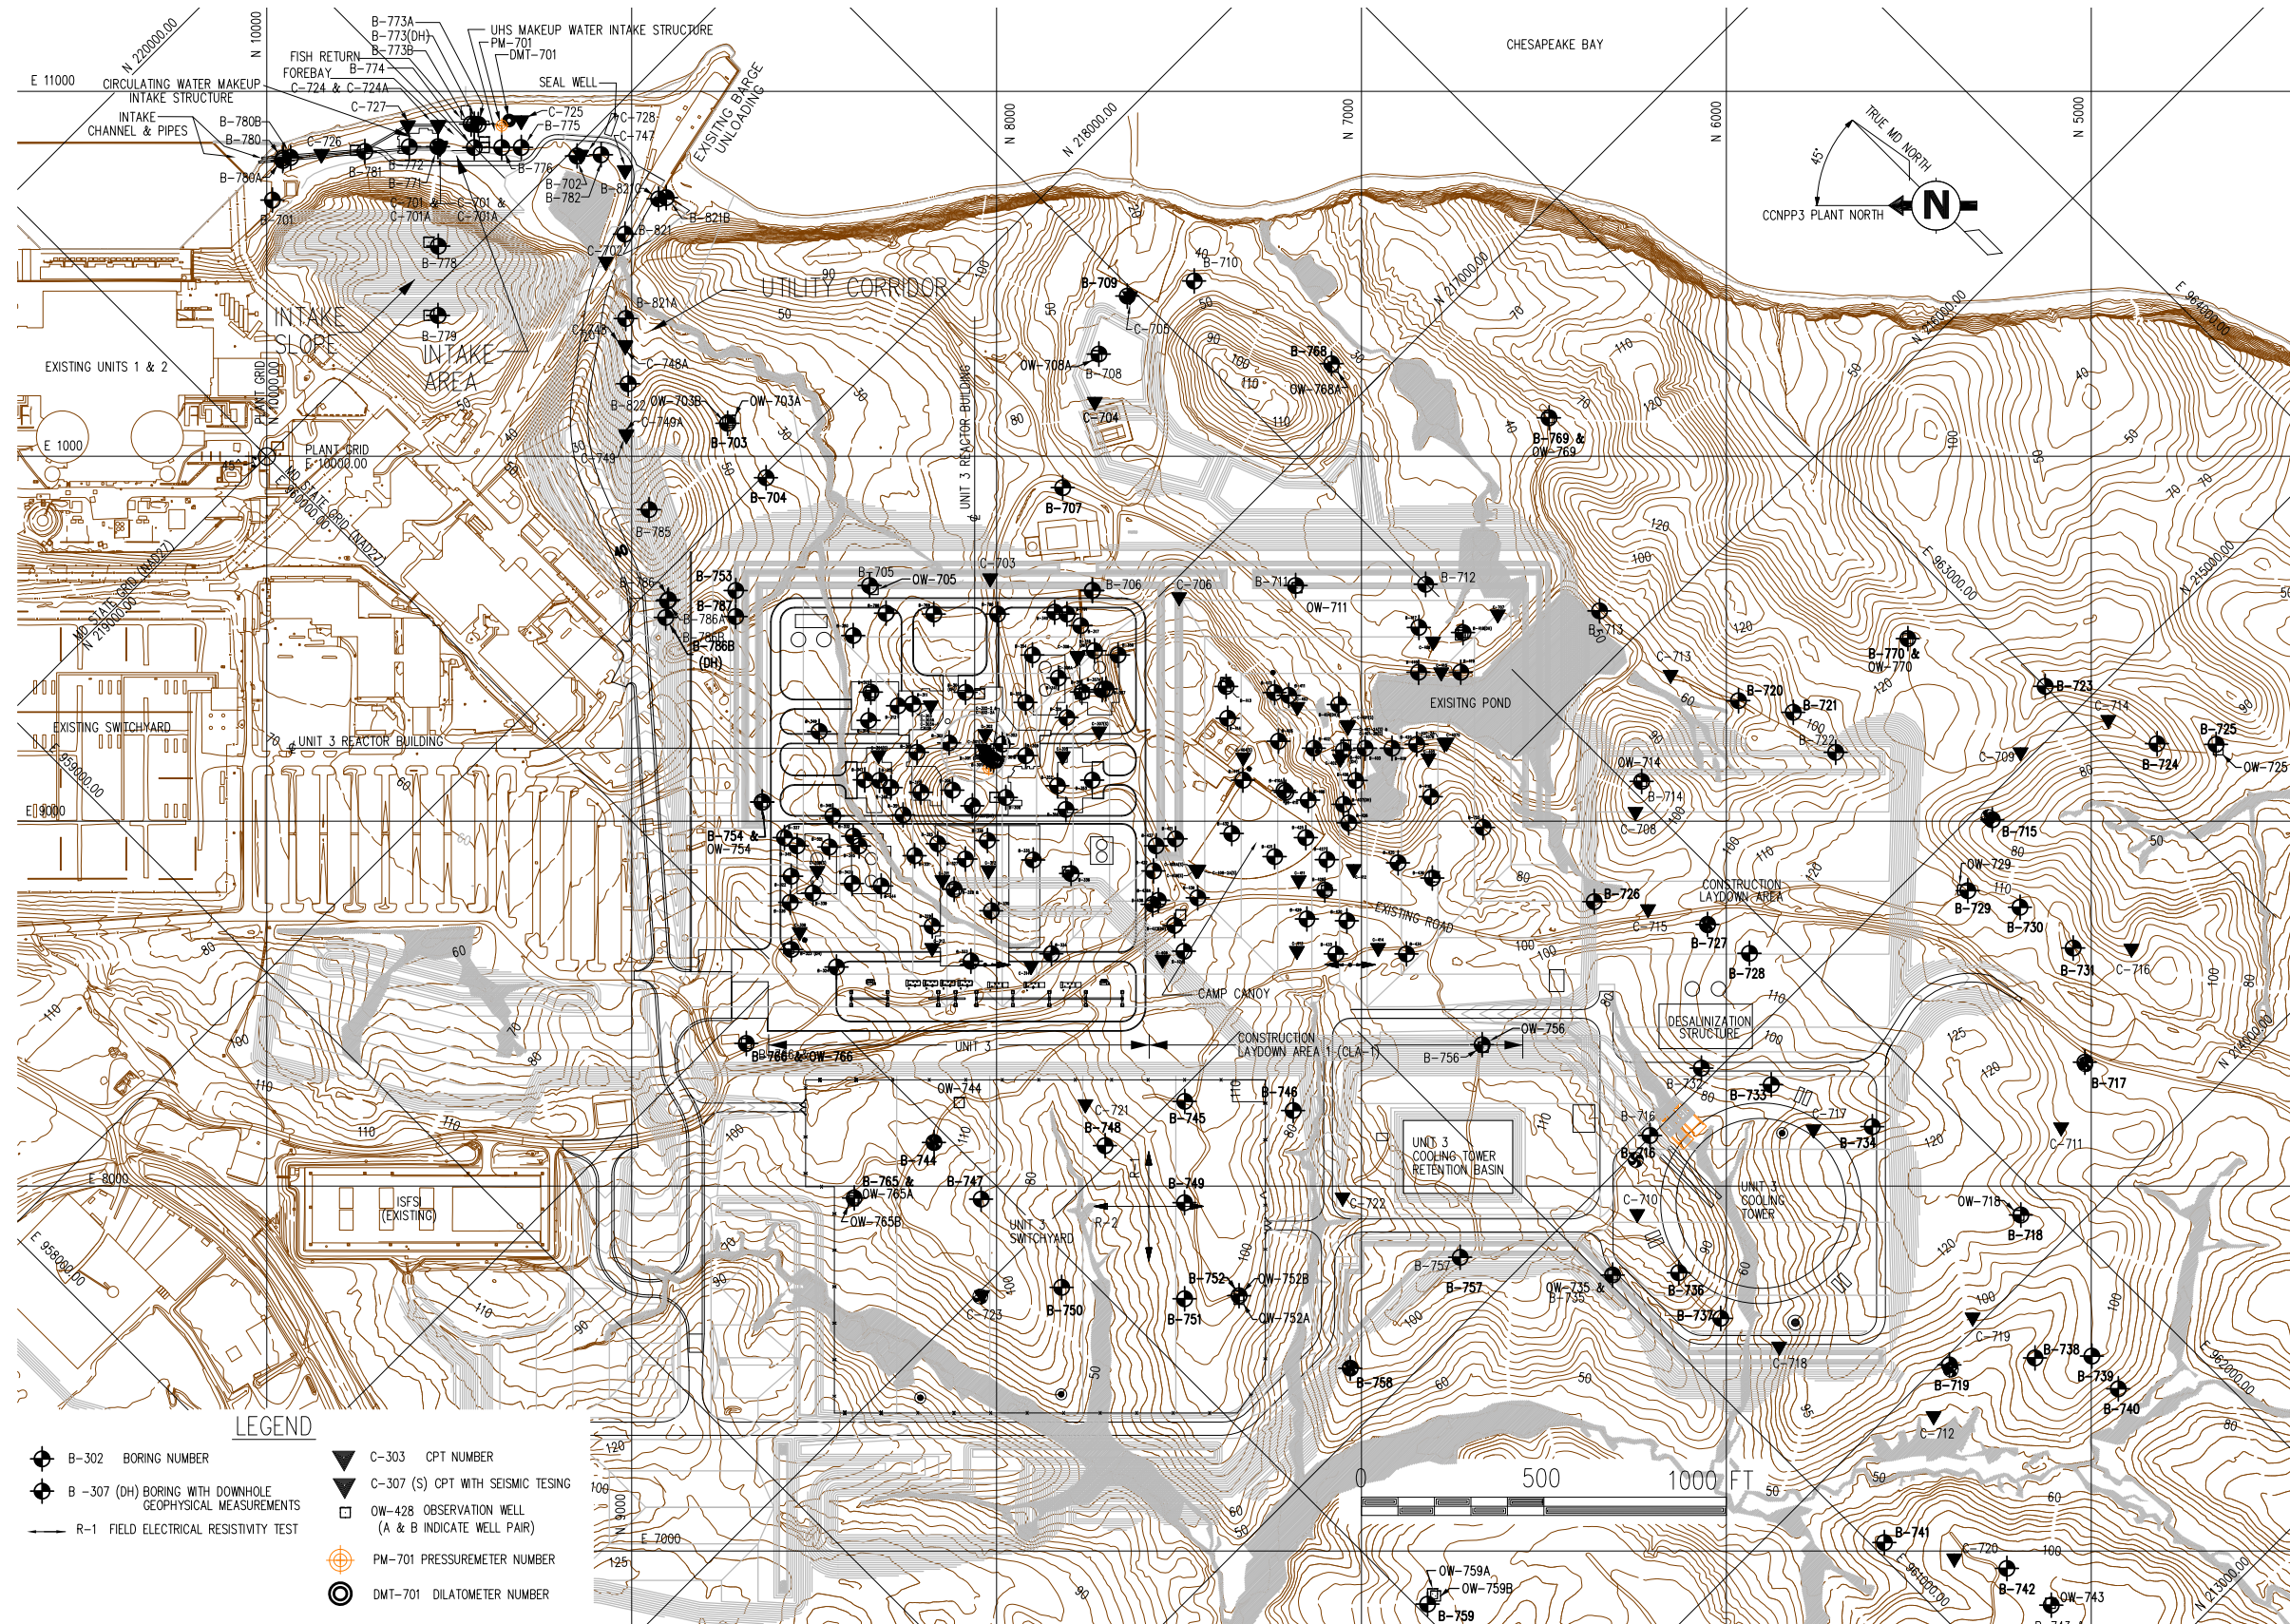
{Site Utilization Plan with Boring Locations}
